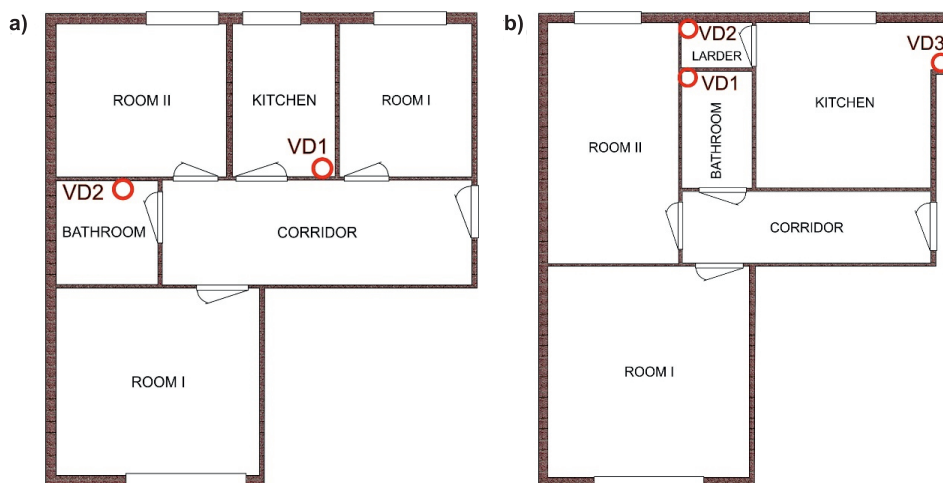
Floor plans of facilities: a) apartment 1, b) apartment 2. VD – ventilation ducts
